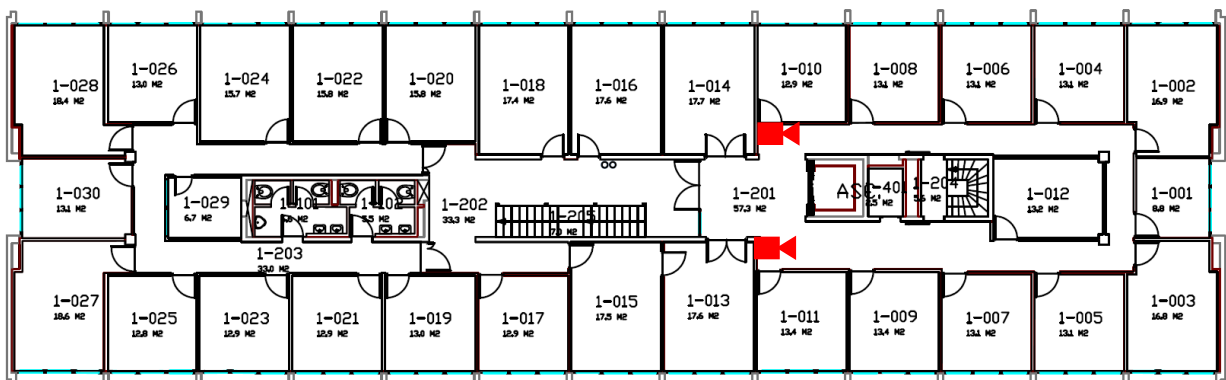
floor R+1 layout as well as the locations and orientations of cameras within this floor – building 1
